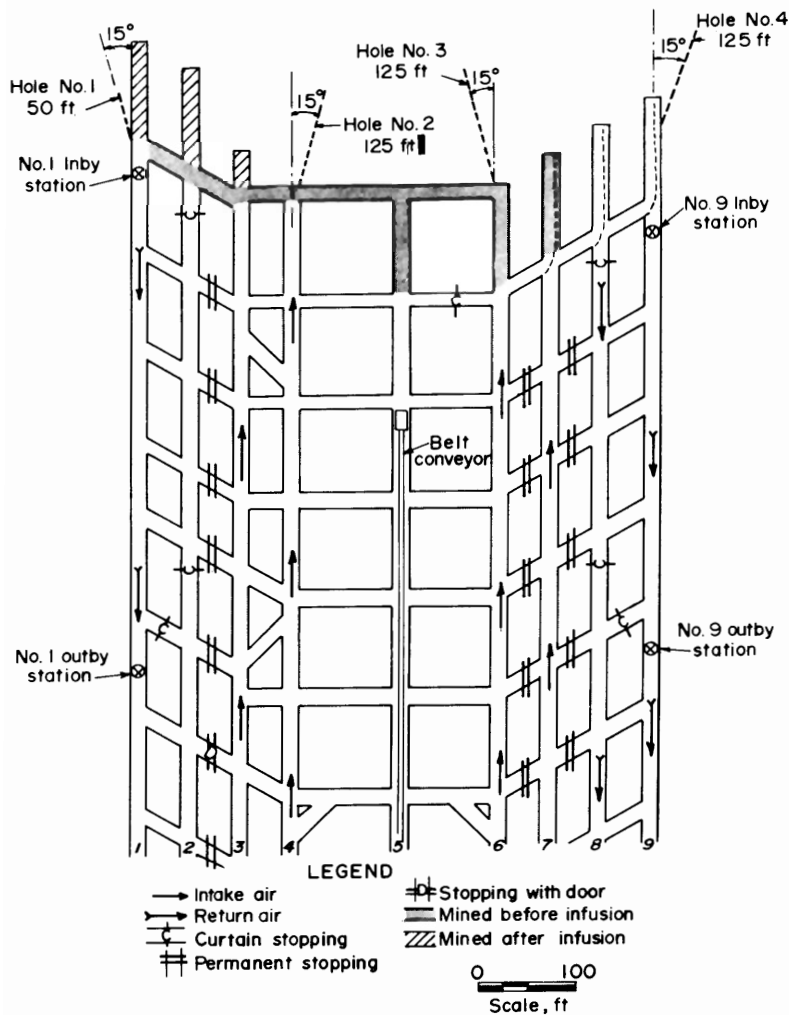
Test section showing location of horizontal holes, methane monitoring stations, and ventilation plan.
